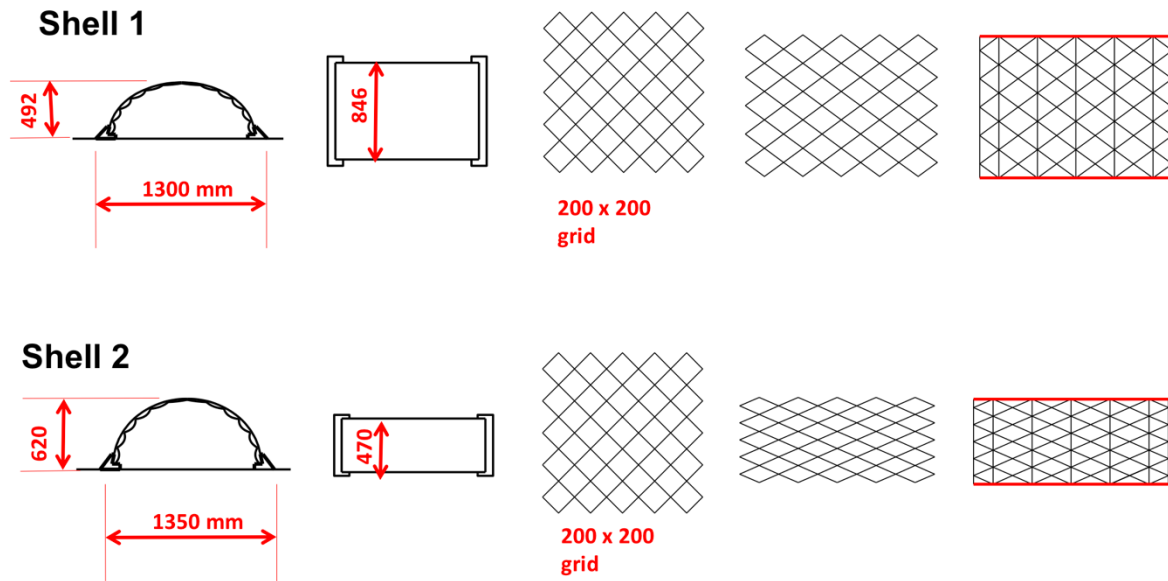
Shells 1 and 2 are constructed using the same deployed gridshell formwork
